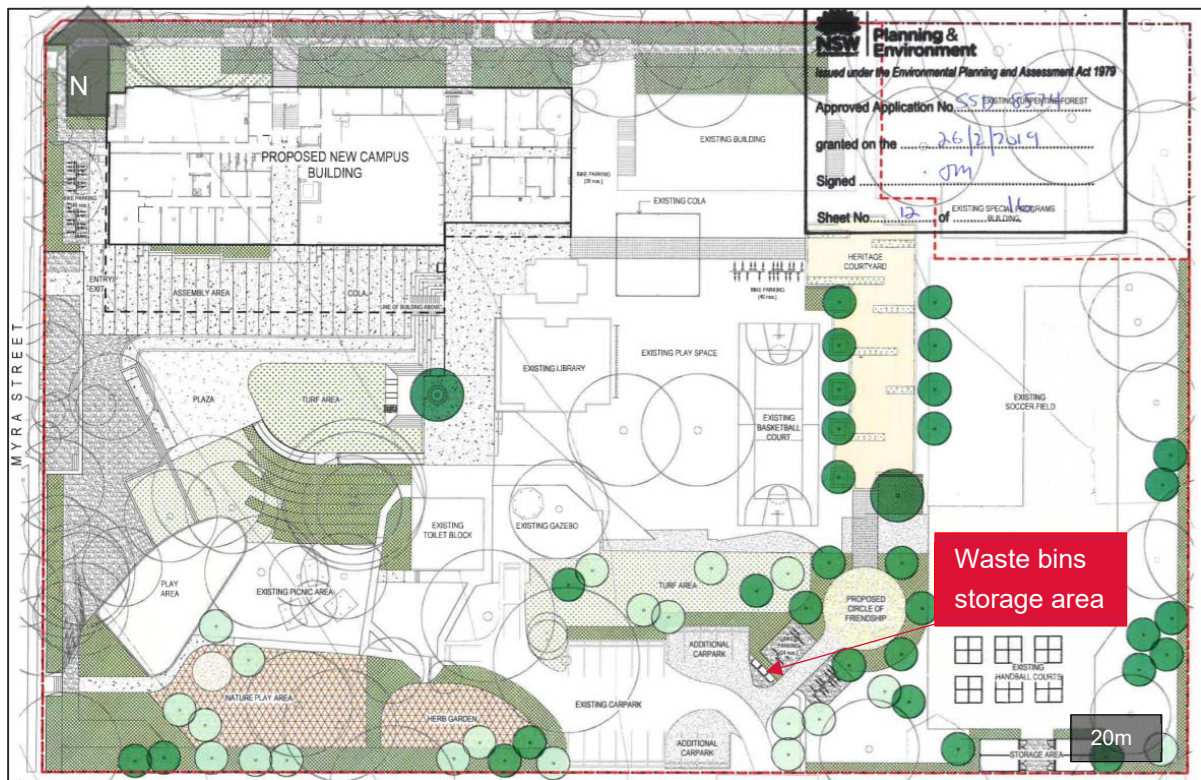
| Approved landscape plan (Source: Department's original assessment report 2019)
